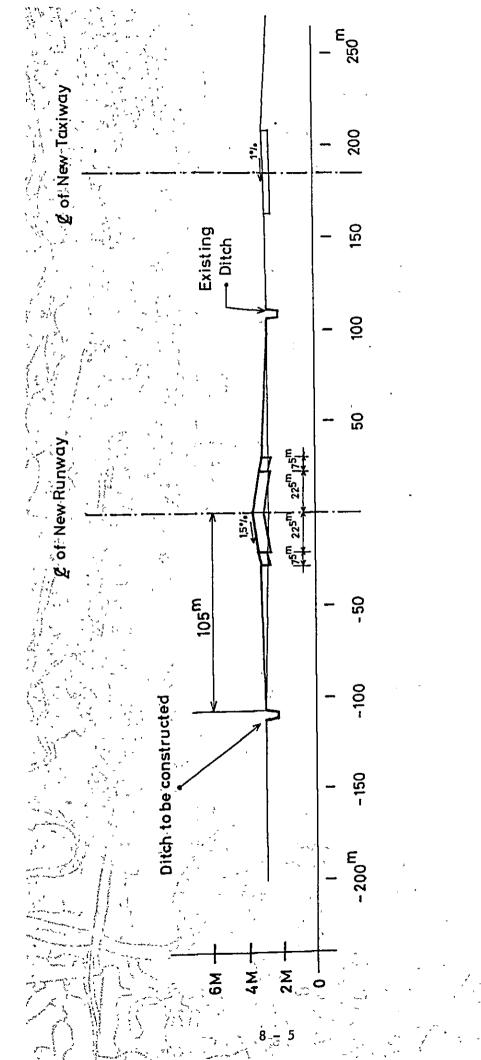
TYPICAL CROSS SECTION AT TABING AIRPORT
